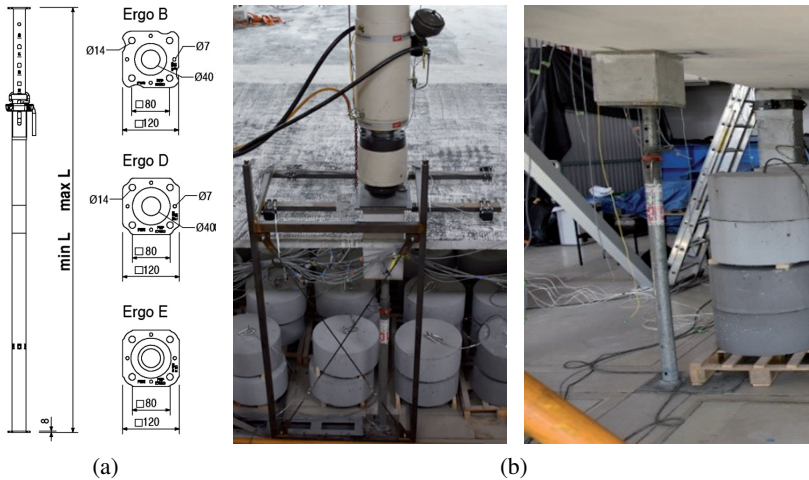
View of slab props in place of removed column: (a) slab props scheme, (b) real view of slab props
